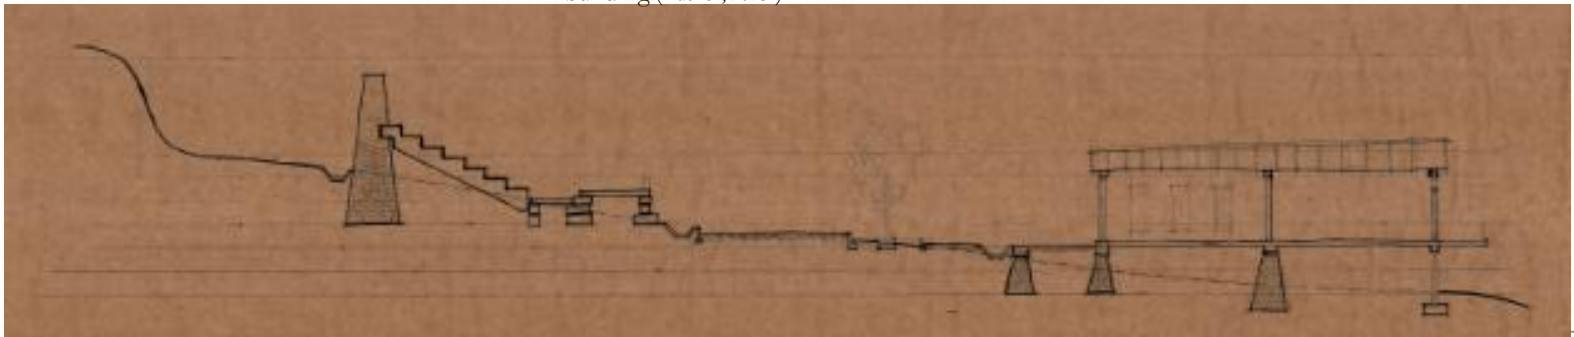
A sectional illustration of slope approach for the building (Author, 2023)
